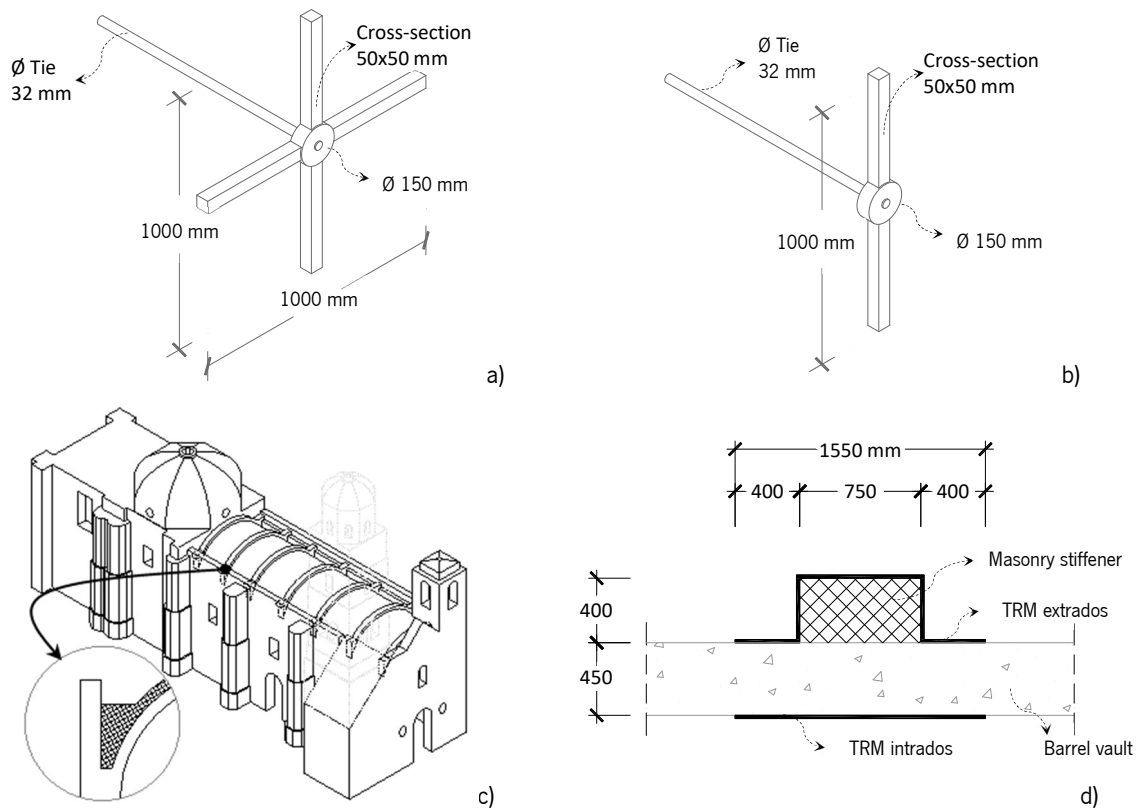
a) Dimensions of anchorage plates at the south wall; b) dimensions of anchorage plates at the north wall; c) location of the masonry stiffeners in the building; d) dimensions of the masonry stiffener and TRM (extrados and intrados).
